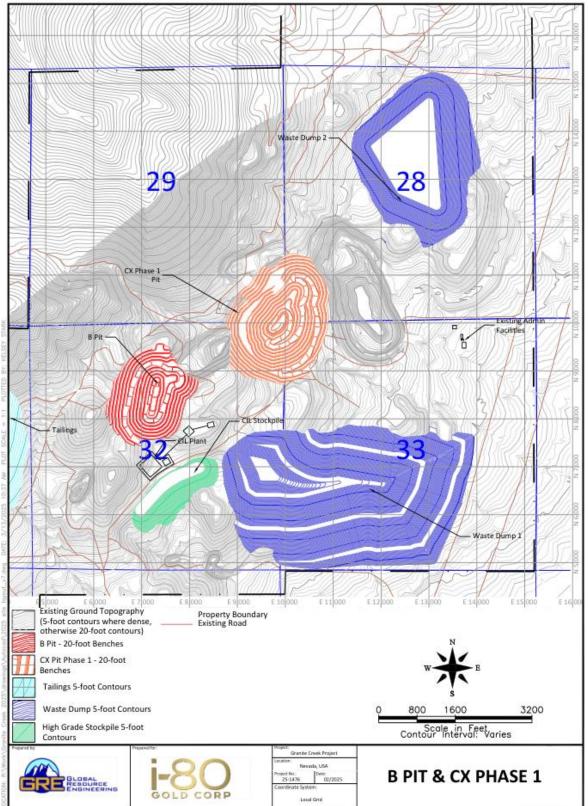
Phased Pit and Site Plan Layout B Pit & CX Phase 1
